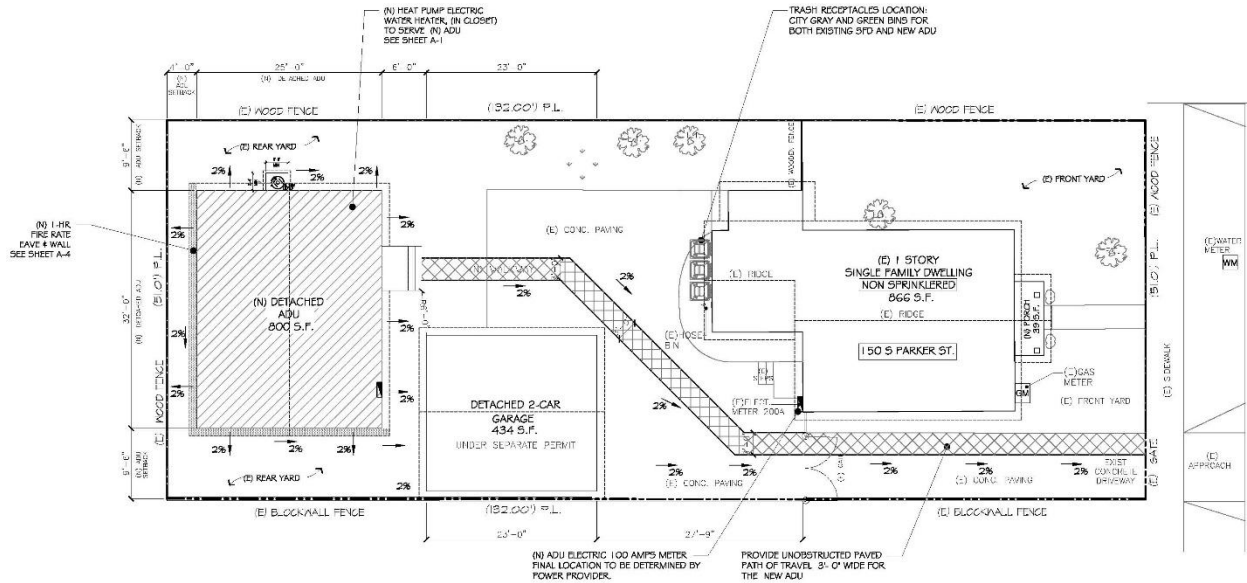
Site plan showing locations of proposed detached garage and detached ADU (not to scale; Allstar Design and Engineering Group)
